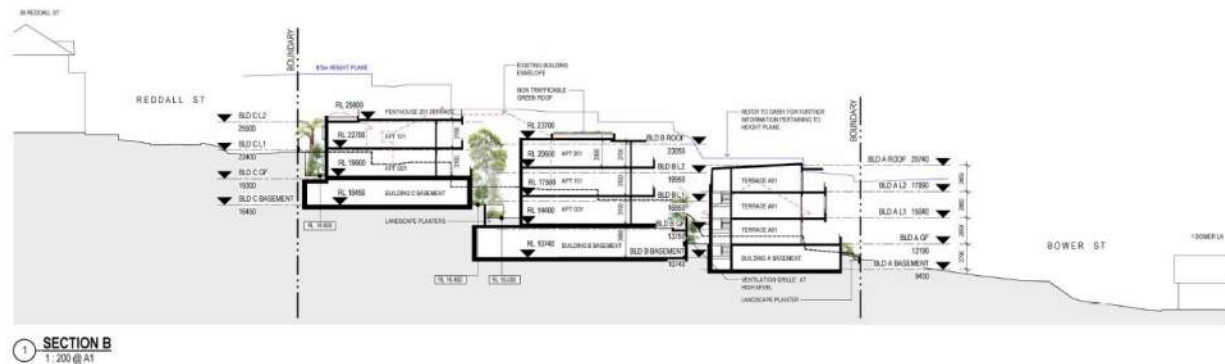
Extract of Section B, from College Street looking west (Source: Squillace)
